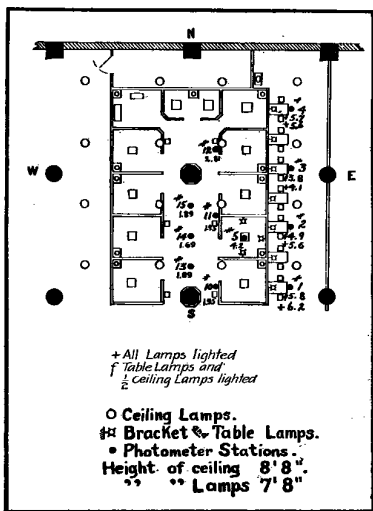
Section plan of main floor mezzanine, showing location of hair-dressing and manicuring parlors, lighting units, test stations and illumination data.
